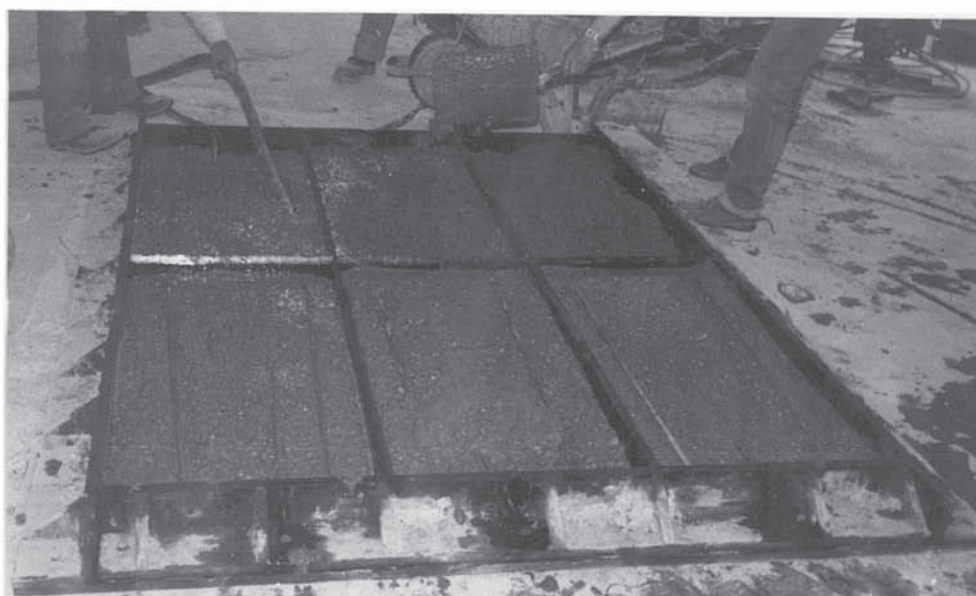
Concrete is Being Placed in the Mould and Vibrating Poker is Used for Compaction
